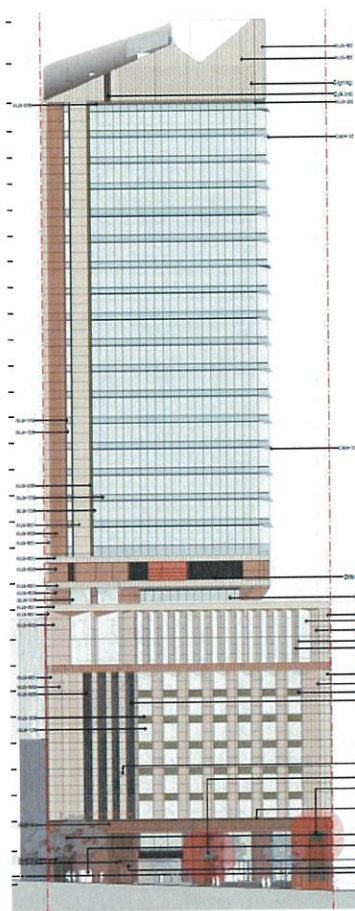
| East elevation (Elizabeth Street) (Source: Applicant's RtS)
